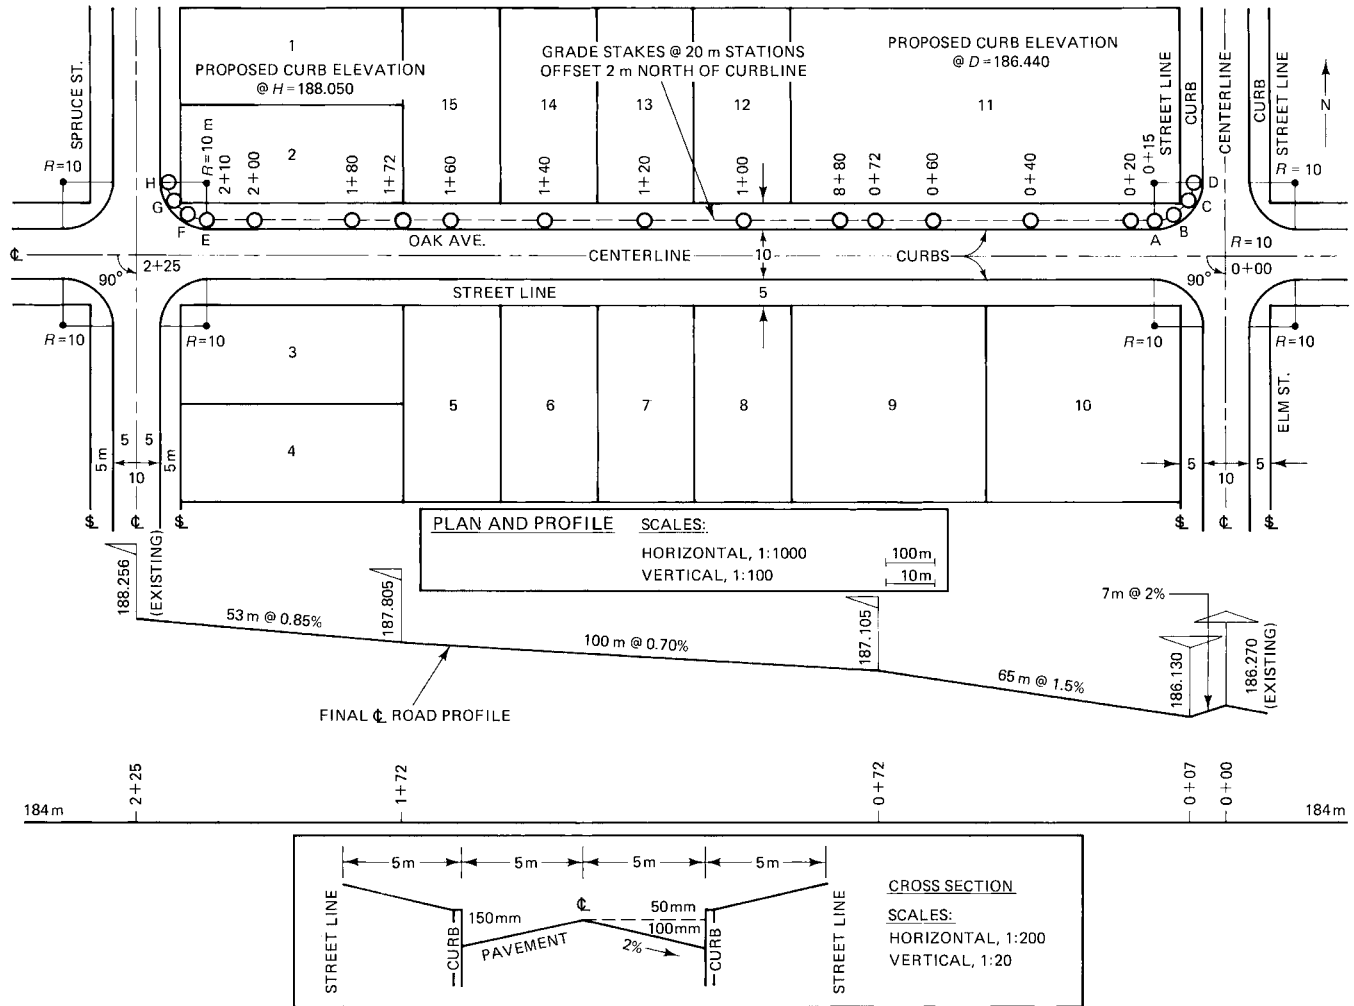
Plan, profile, and cross section for pavement and curbs, Oak Avenue (metric units). See also Figure 14.25.
